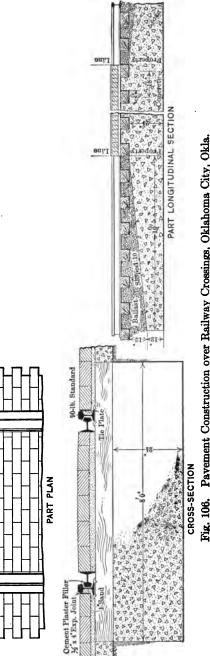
Pavement Construction over Railway Crossings, Oklahoma City, Okla.
